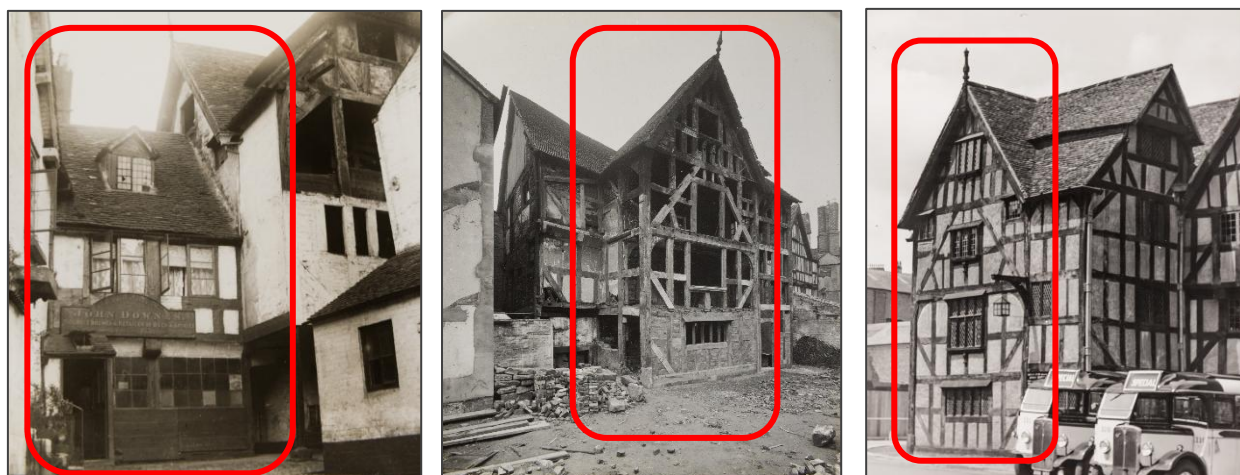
(Left) Three storey east wing from NE (behind attached stair tower) prior to the demolition of its two storey section, in use as the New Ship Inn; Centre (SA:6601/3191/18): East wing following demolition of the New Ship Inn and buildings along Barker Street from SE, during repair in October 1932 (SA:6601/3191/28); Right: East wing from NE in 1950s (SA: PH/S/13/B/1/33).
